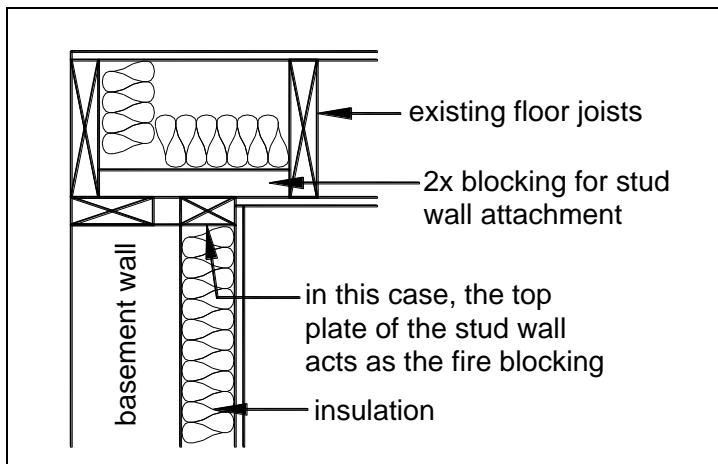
TYPICAL FIRE BLOCKING DETAIL
